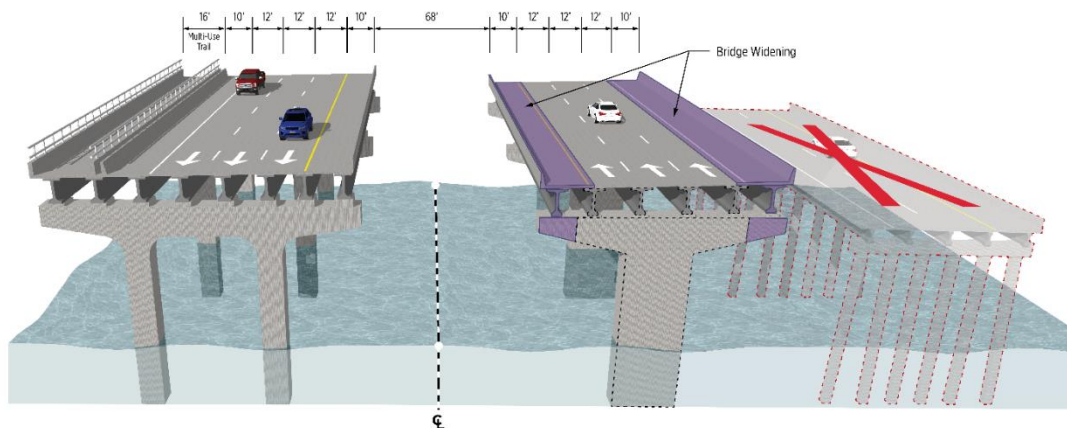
Segment 2 – Typical Section 4 Bridges over Old Tampa Bay
